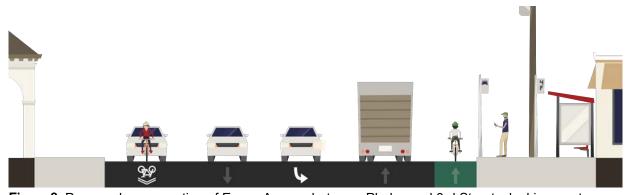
Proposed cross section of Evans Avenue between Phelps and 3rd Streets, looking west
